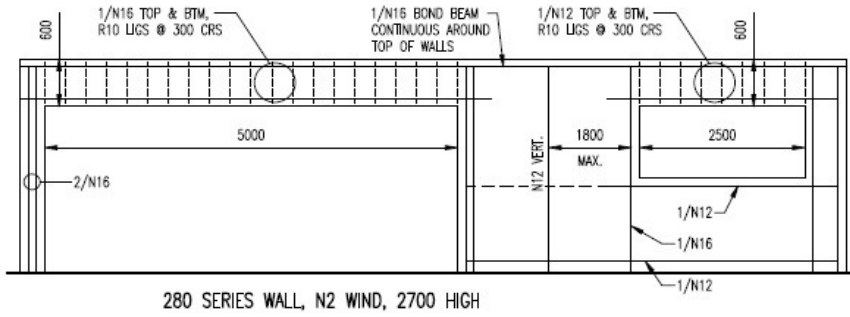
2700 High Wall, N2 Wind Rating, 280 Series ECO-Block (Max. roof load width: 10.0m)
